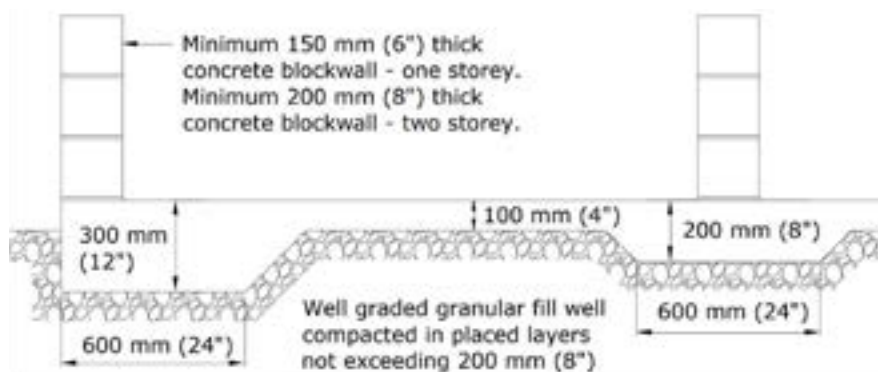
LAYOUT OF SLAB-ON-GROUND FOOTING
